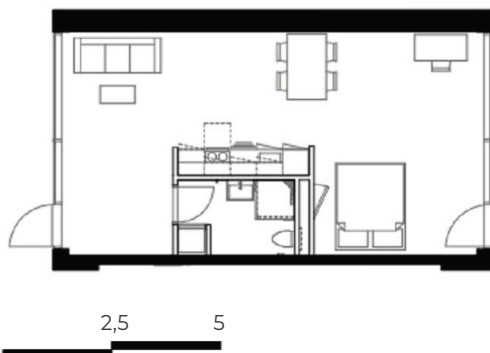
Sneglehusene Plan 1 Bedroom Apartment (BIG)
